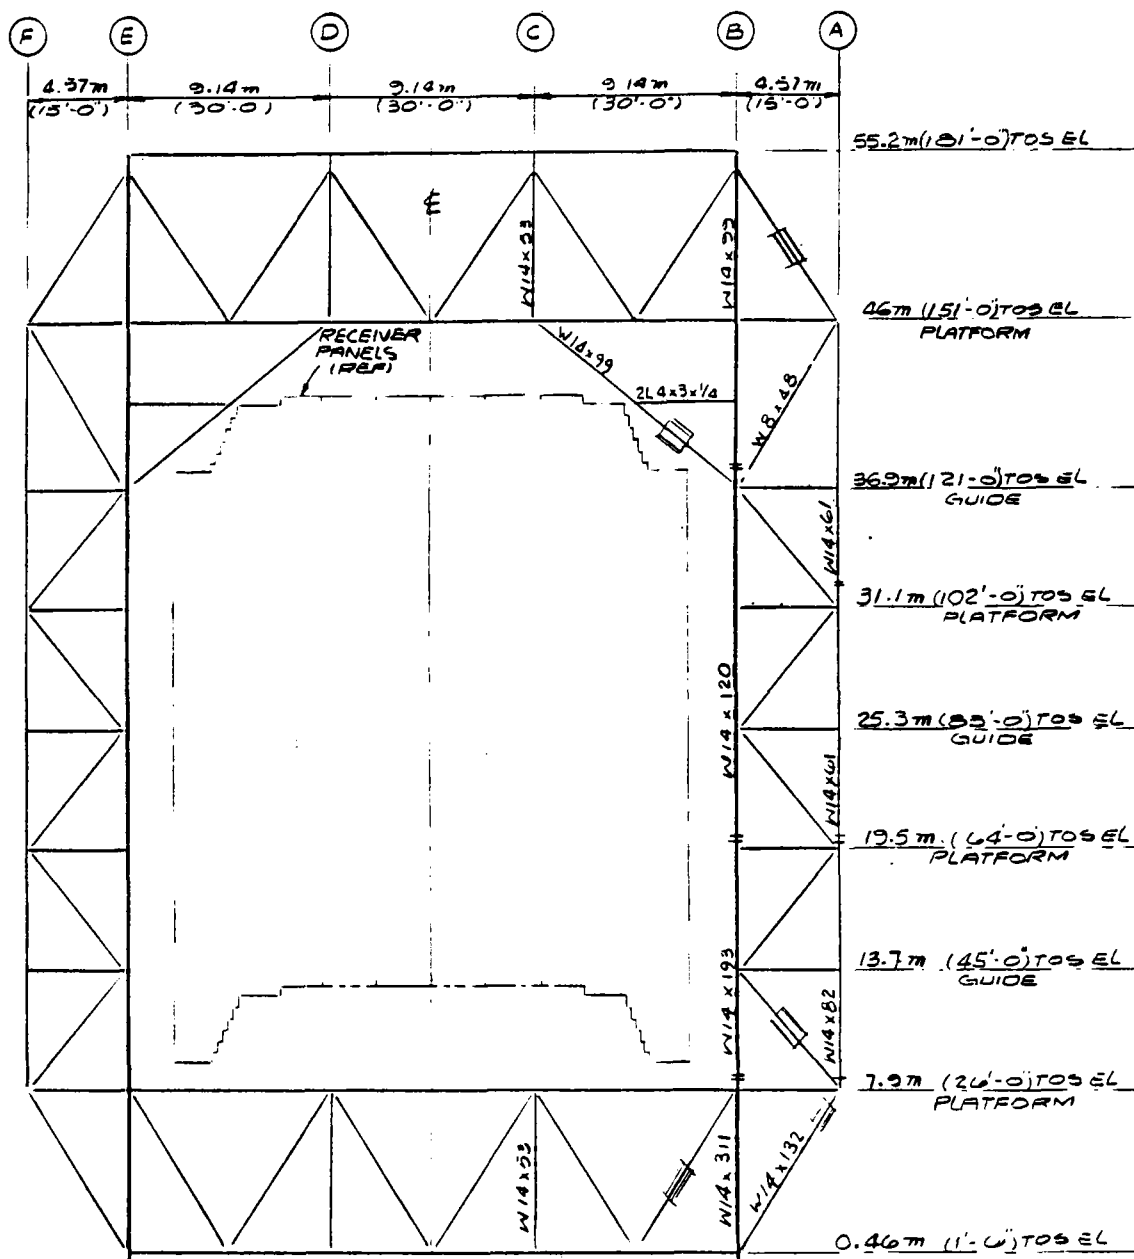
Front Elevation of Receiver Structure--Bent 1
